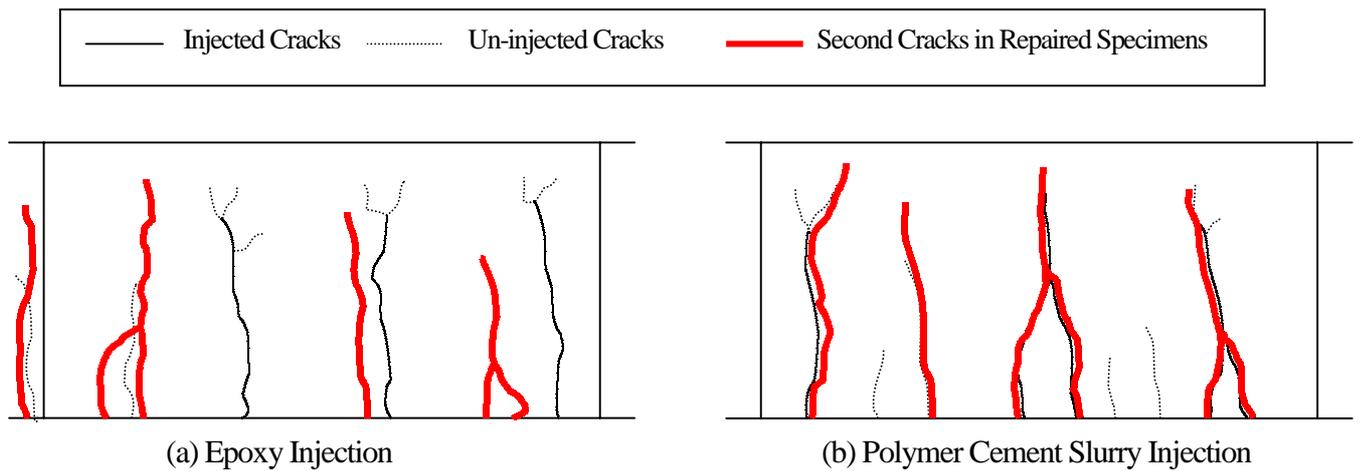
Mechanical Properties of Repaired Reinforced Concrete Beams with Polymer Cement Slurry Injection
